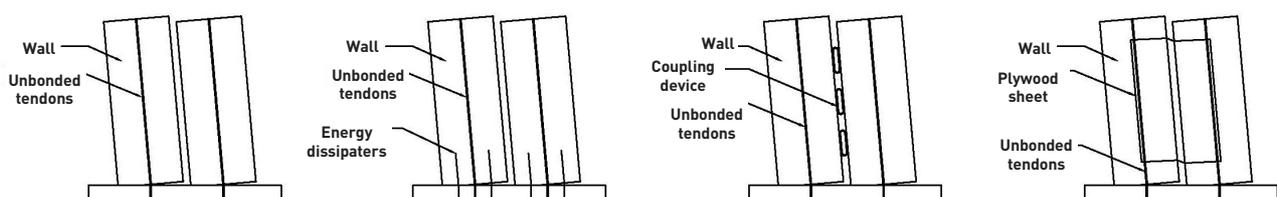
Post-tensioned rocking walls, post-tensioned hybrid walls and post-tensioned coupled walls.
